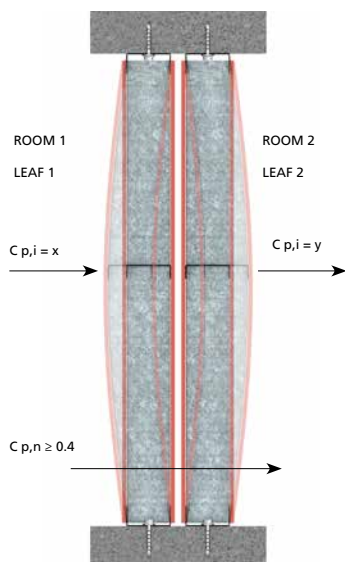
(B): PRESSURE SEALED TWIN WALL
